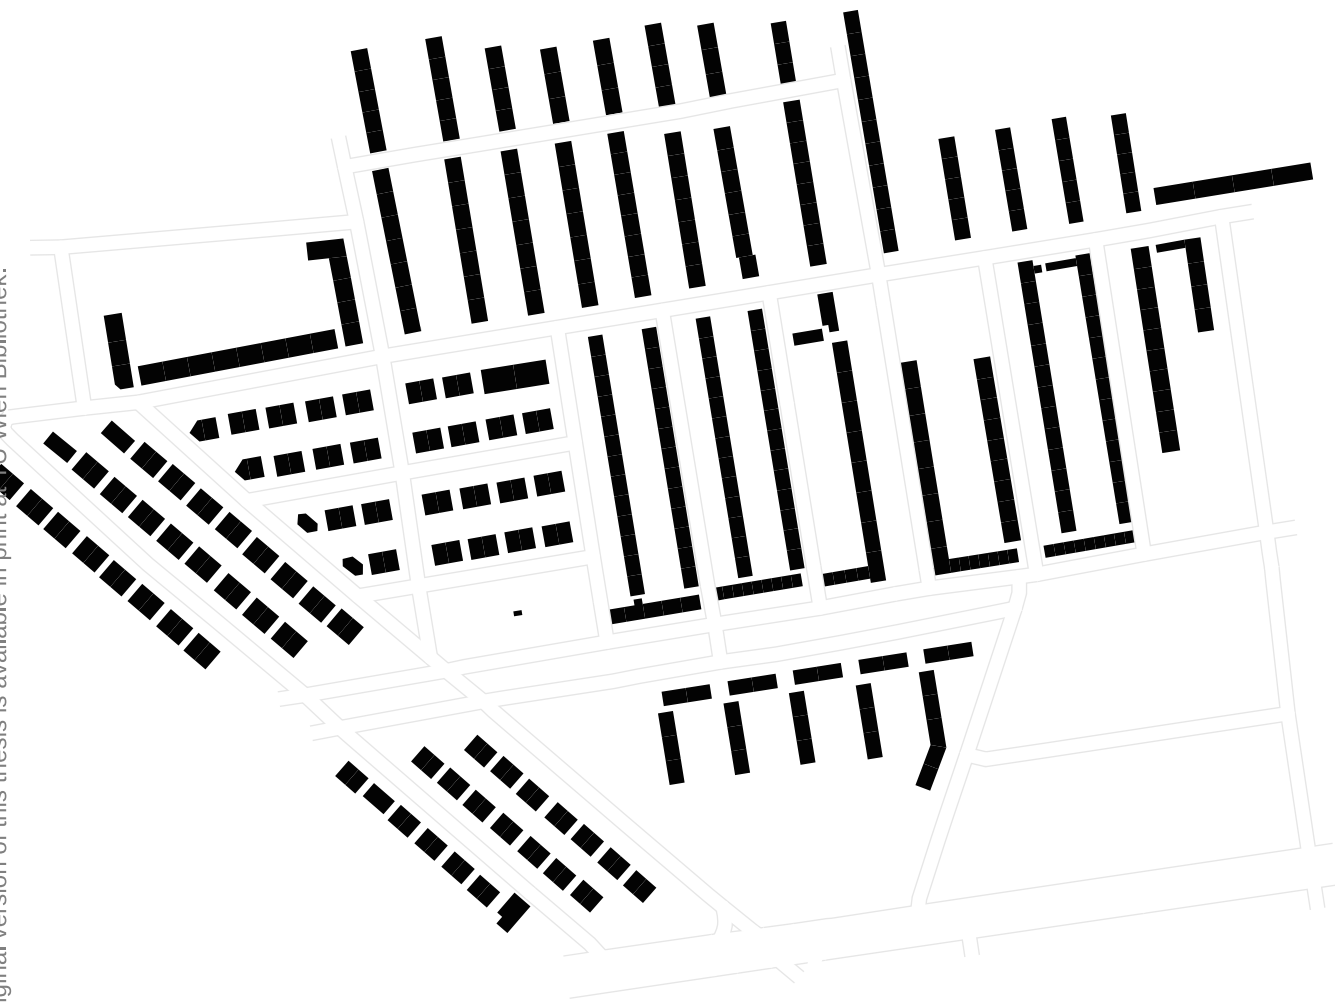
Site plan, Siedlung Hellerhof - 1:5000
